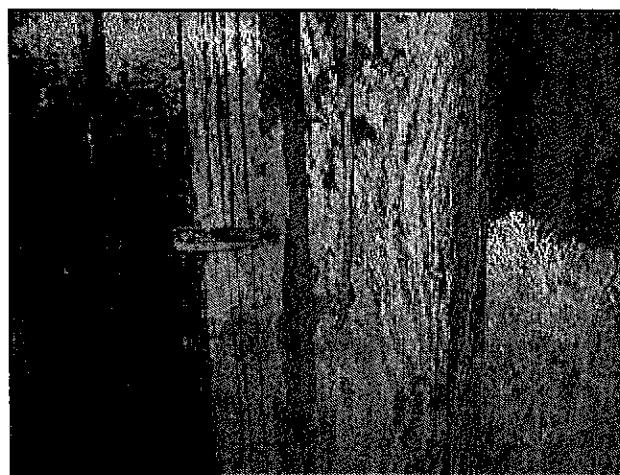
Rotten Timber – 4 inch penetration Vertical Mud Seam.
